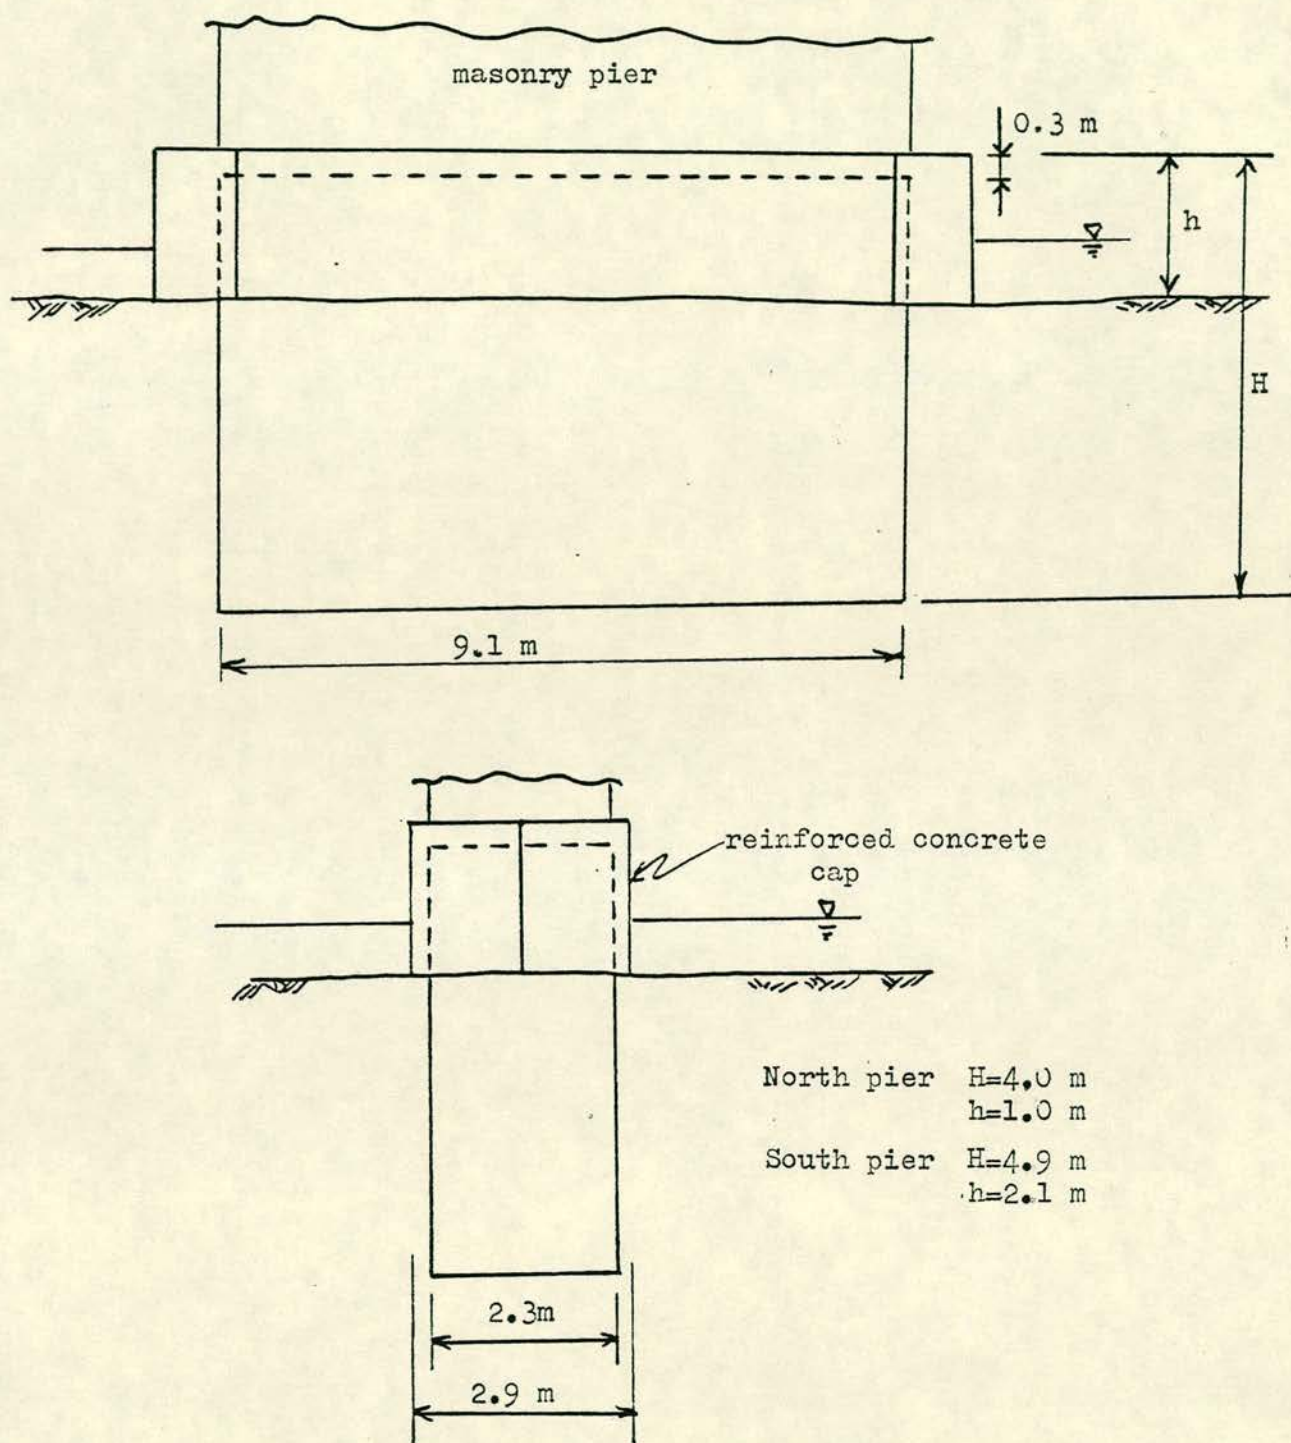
Victoria Bridge - Caputh - elevation, piers dimensions and details
